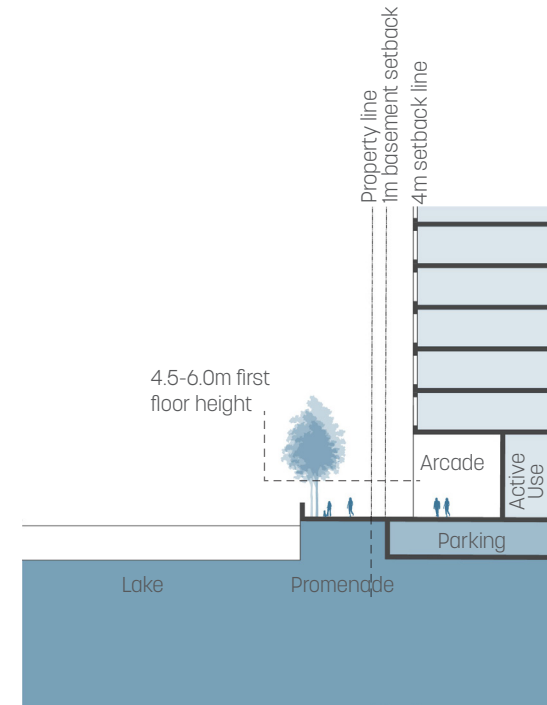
Section of Cultural Centre Building, located within Lakefront Park
